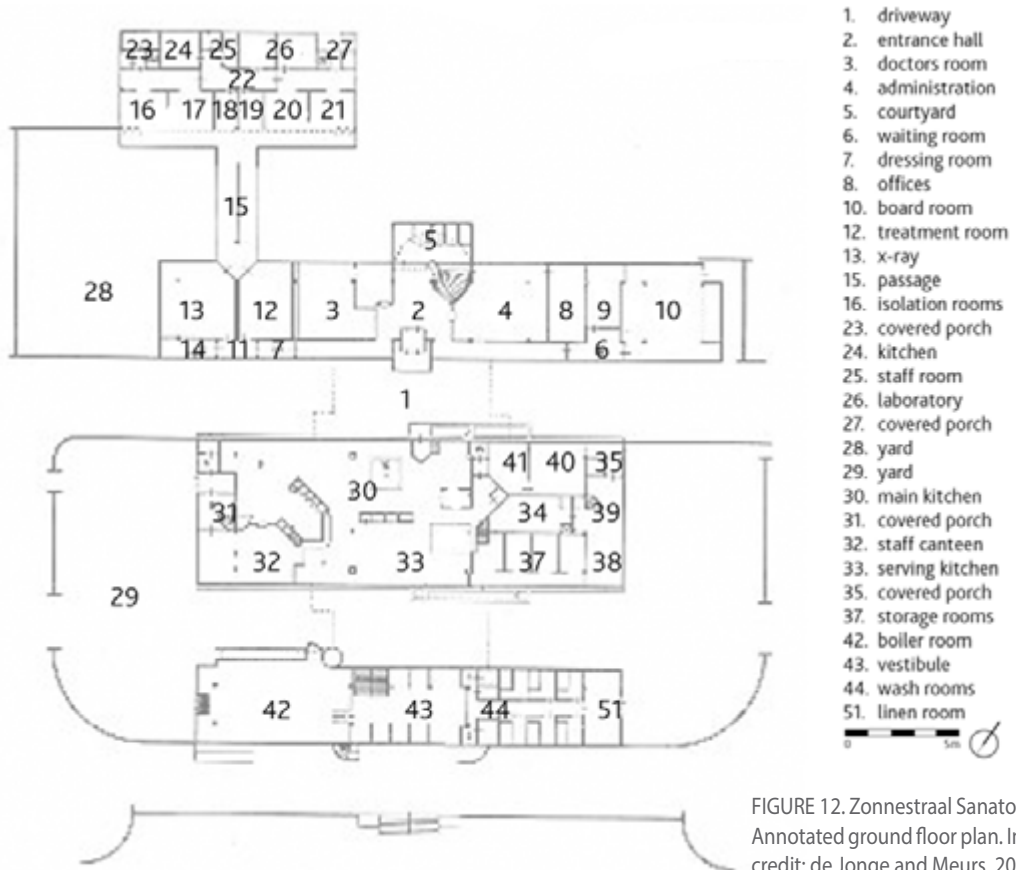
Zonnestraal Sanatorium: Annotated ground floor plan. Image credit: de Jonge and Meurs, 2010.
